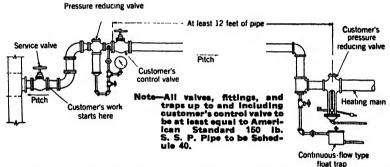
Steam Supply Connection when Using Two Reducing Valves
